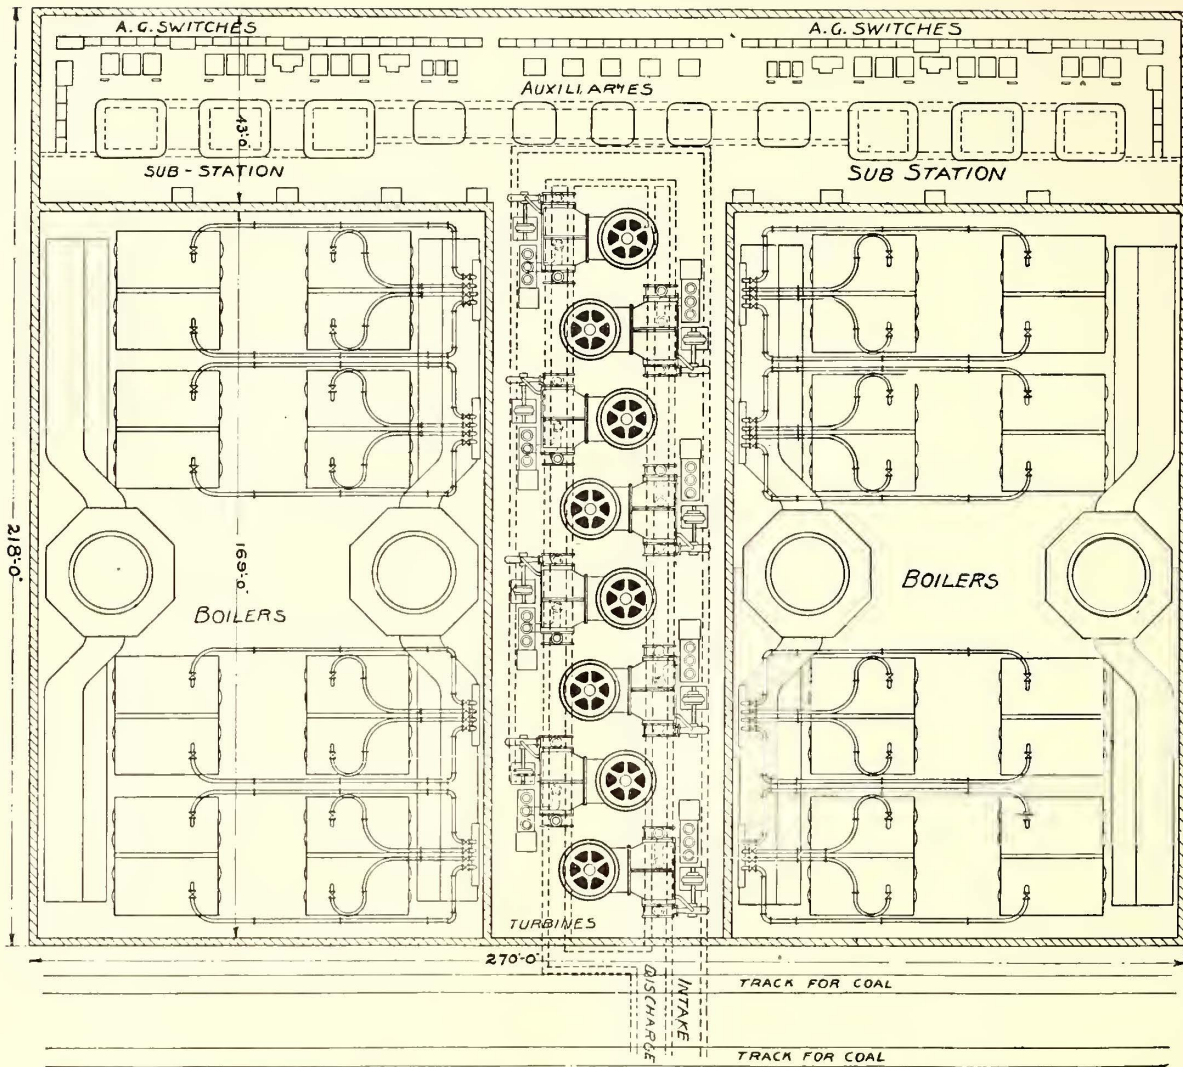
PLAN OF PROPOSED TURBINE STATION AND SUB-STATION
